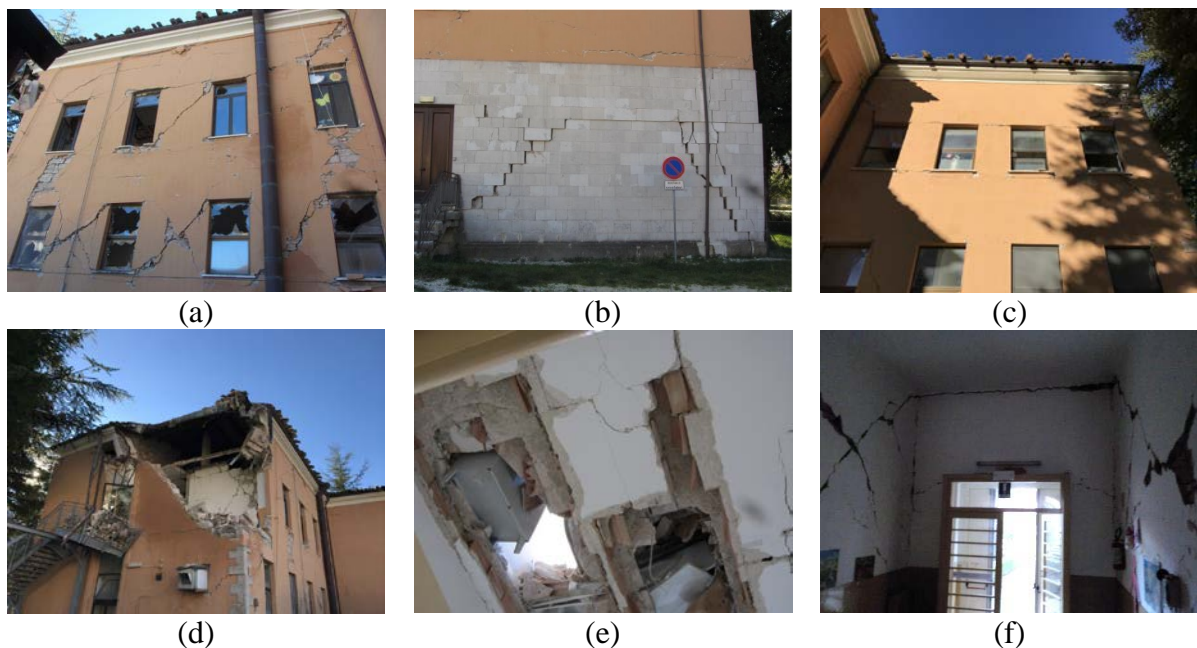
Damage state updated on December 8th, 2016: (a) diagonal shear cracks in piers and spandrels, (b) shear-sliding mechanism, (c) out-of-plane mechanism, (d) flexural cracks, (e) local collapse of the slab between raised ground floor and first floor, (f) cracks in correspondence of the connection between walls and slabs [6].
